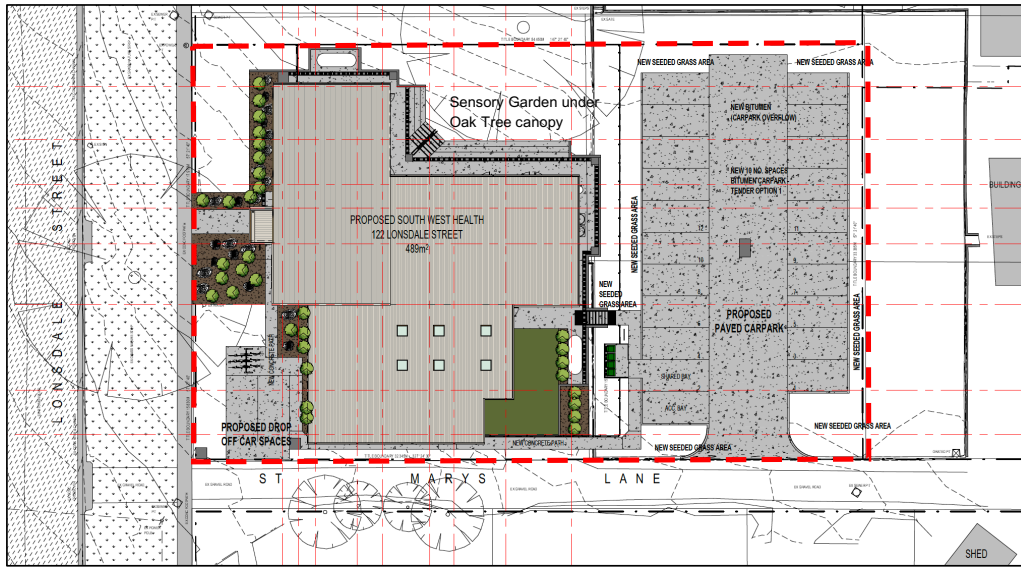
Site layout showing title boundary in red dash – showing 20 spaces in rear carpark and 2 drop of spaces in front garden.
